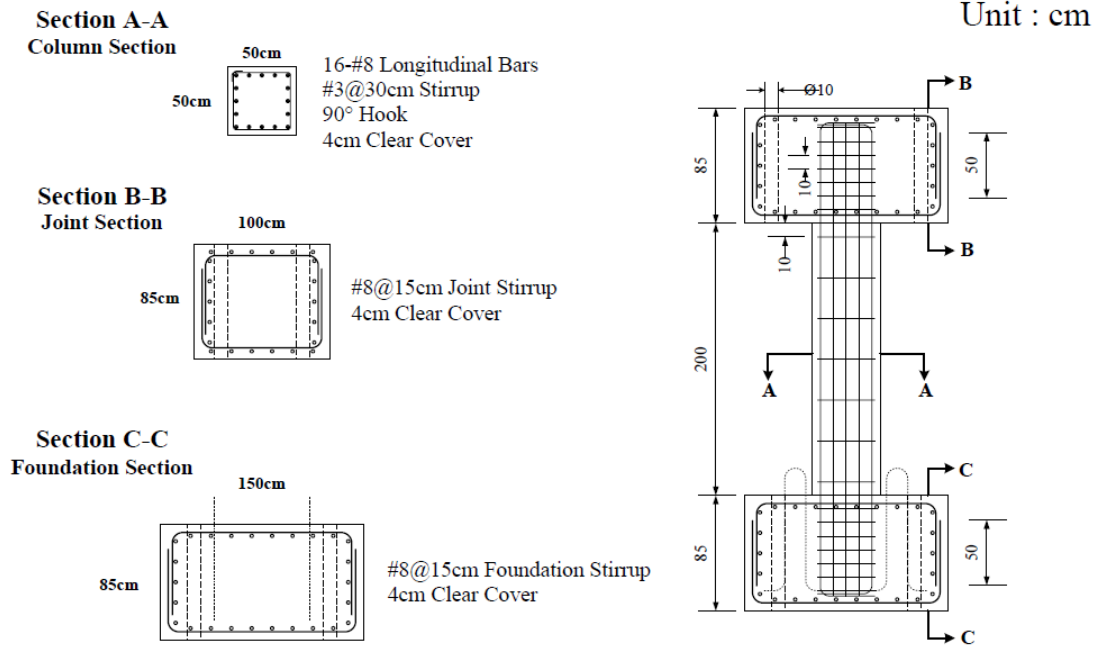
Cyclic loading test 4NL specimen design layout (Weng 2007)
